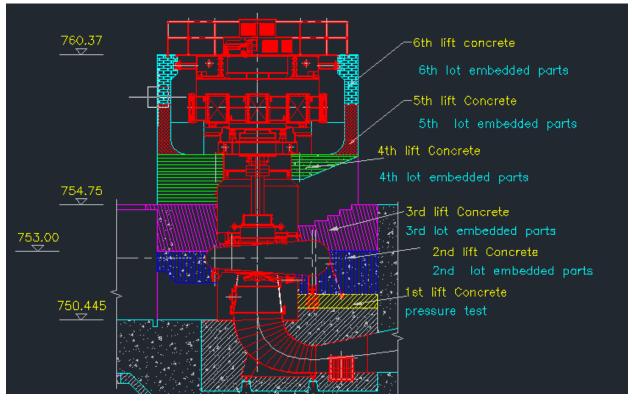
Picture showing installation interface between Civil and EM Works 2.4.3.1 INSTALLATION OF COOLING WATER PUMP
